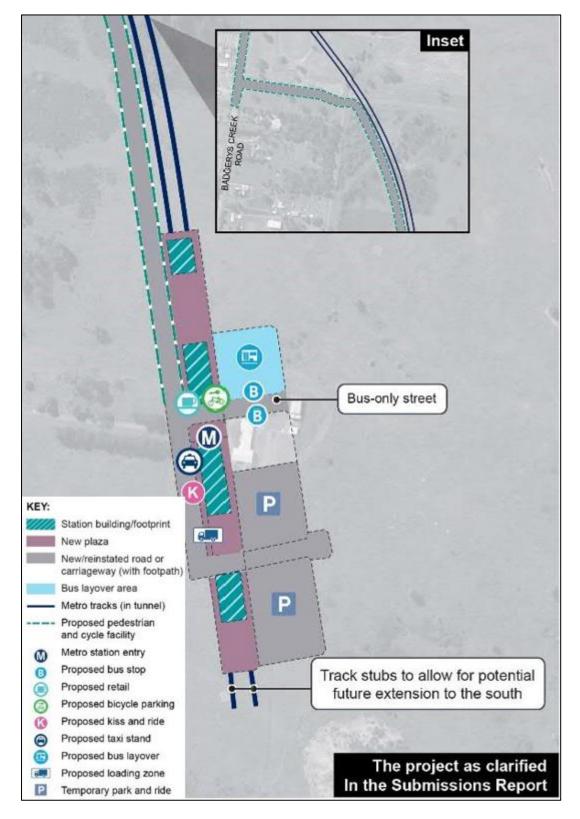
Aerotropolis Core Station – Indicative layout and key design elements - approved project (SMWSA Submissions Report, 2021)
